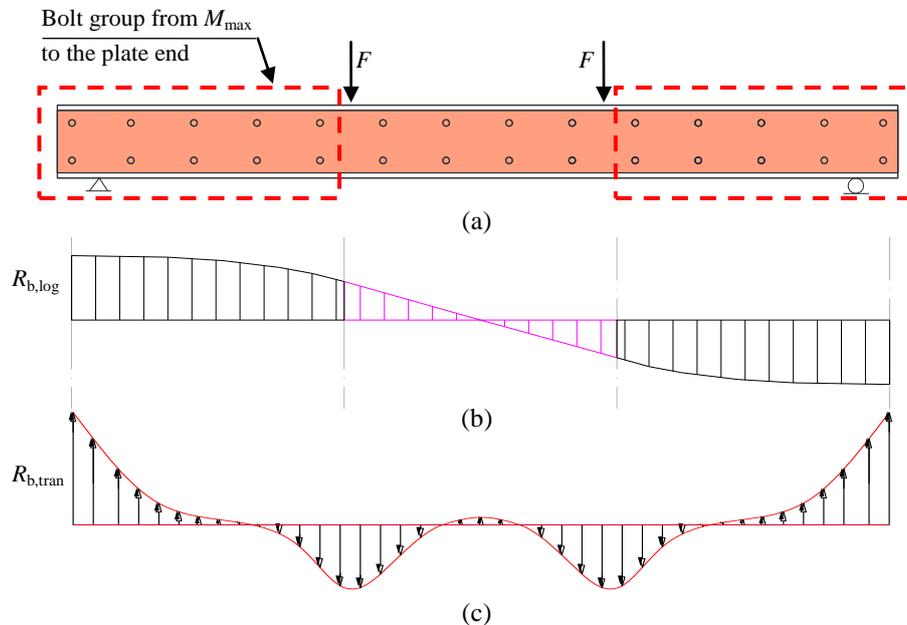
The variation of bolt shear force in a BSP beam: (a) elevation view, force variation of (b) longitudinal and (c) transverse bolt shear force
